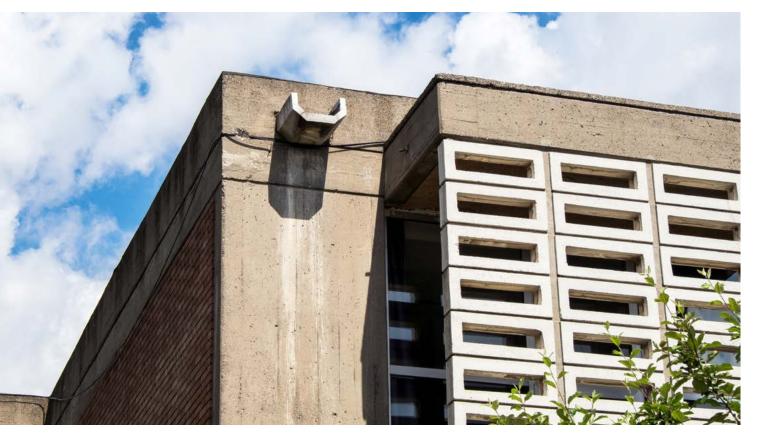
Brise-soleil shading elements on the west-facing classrooms
